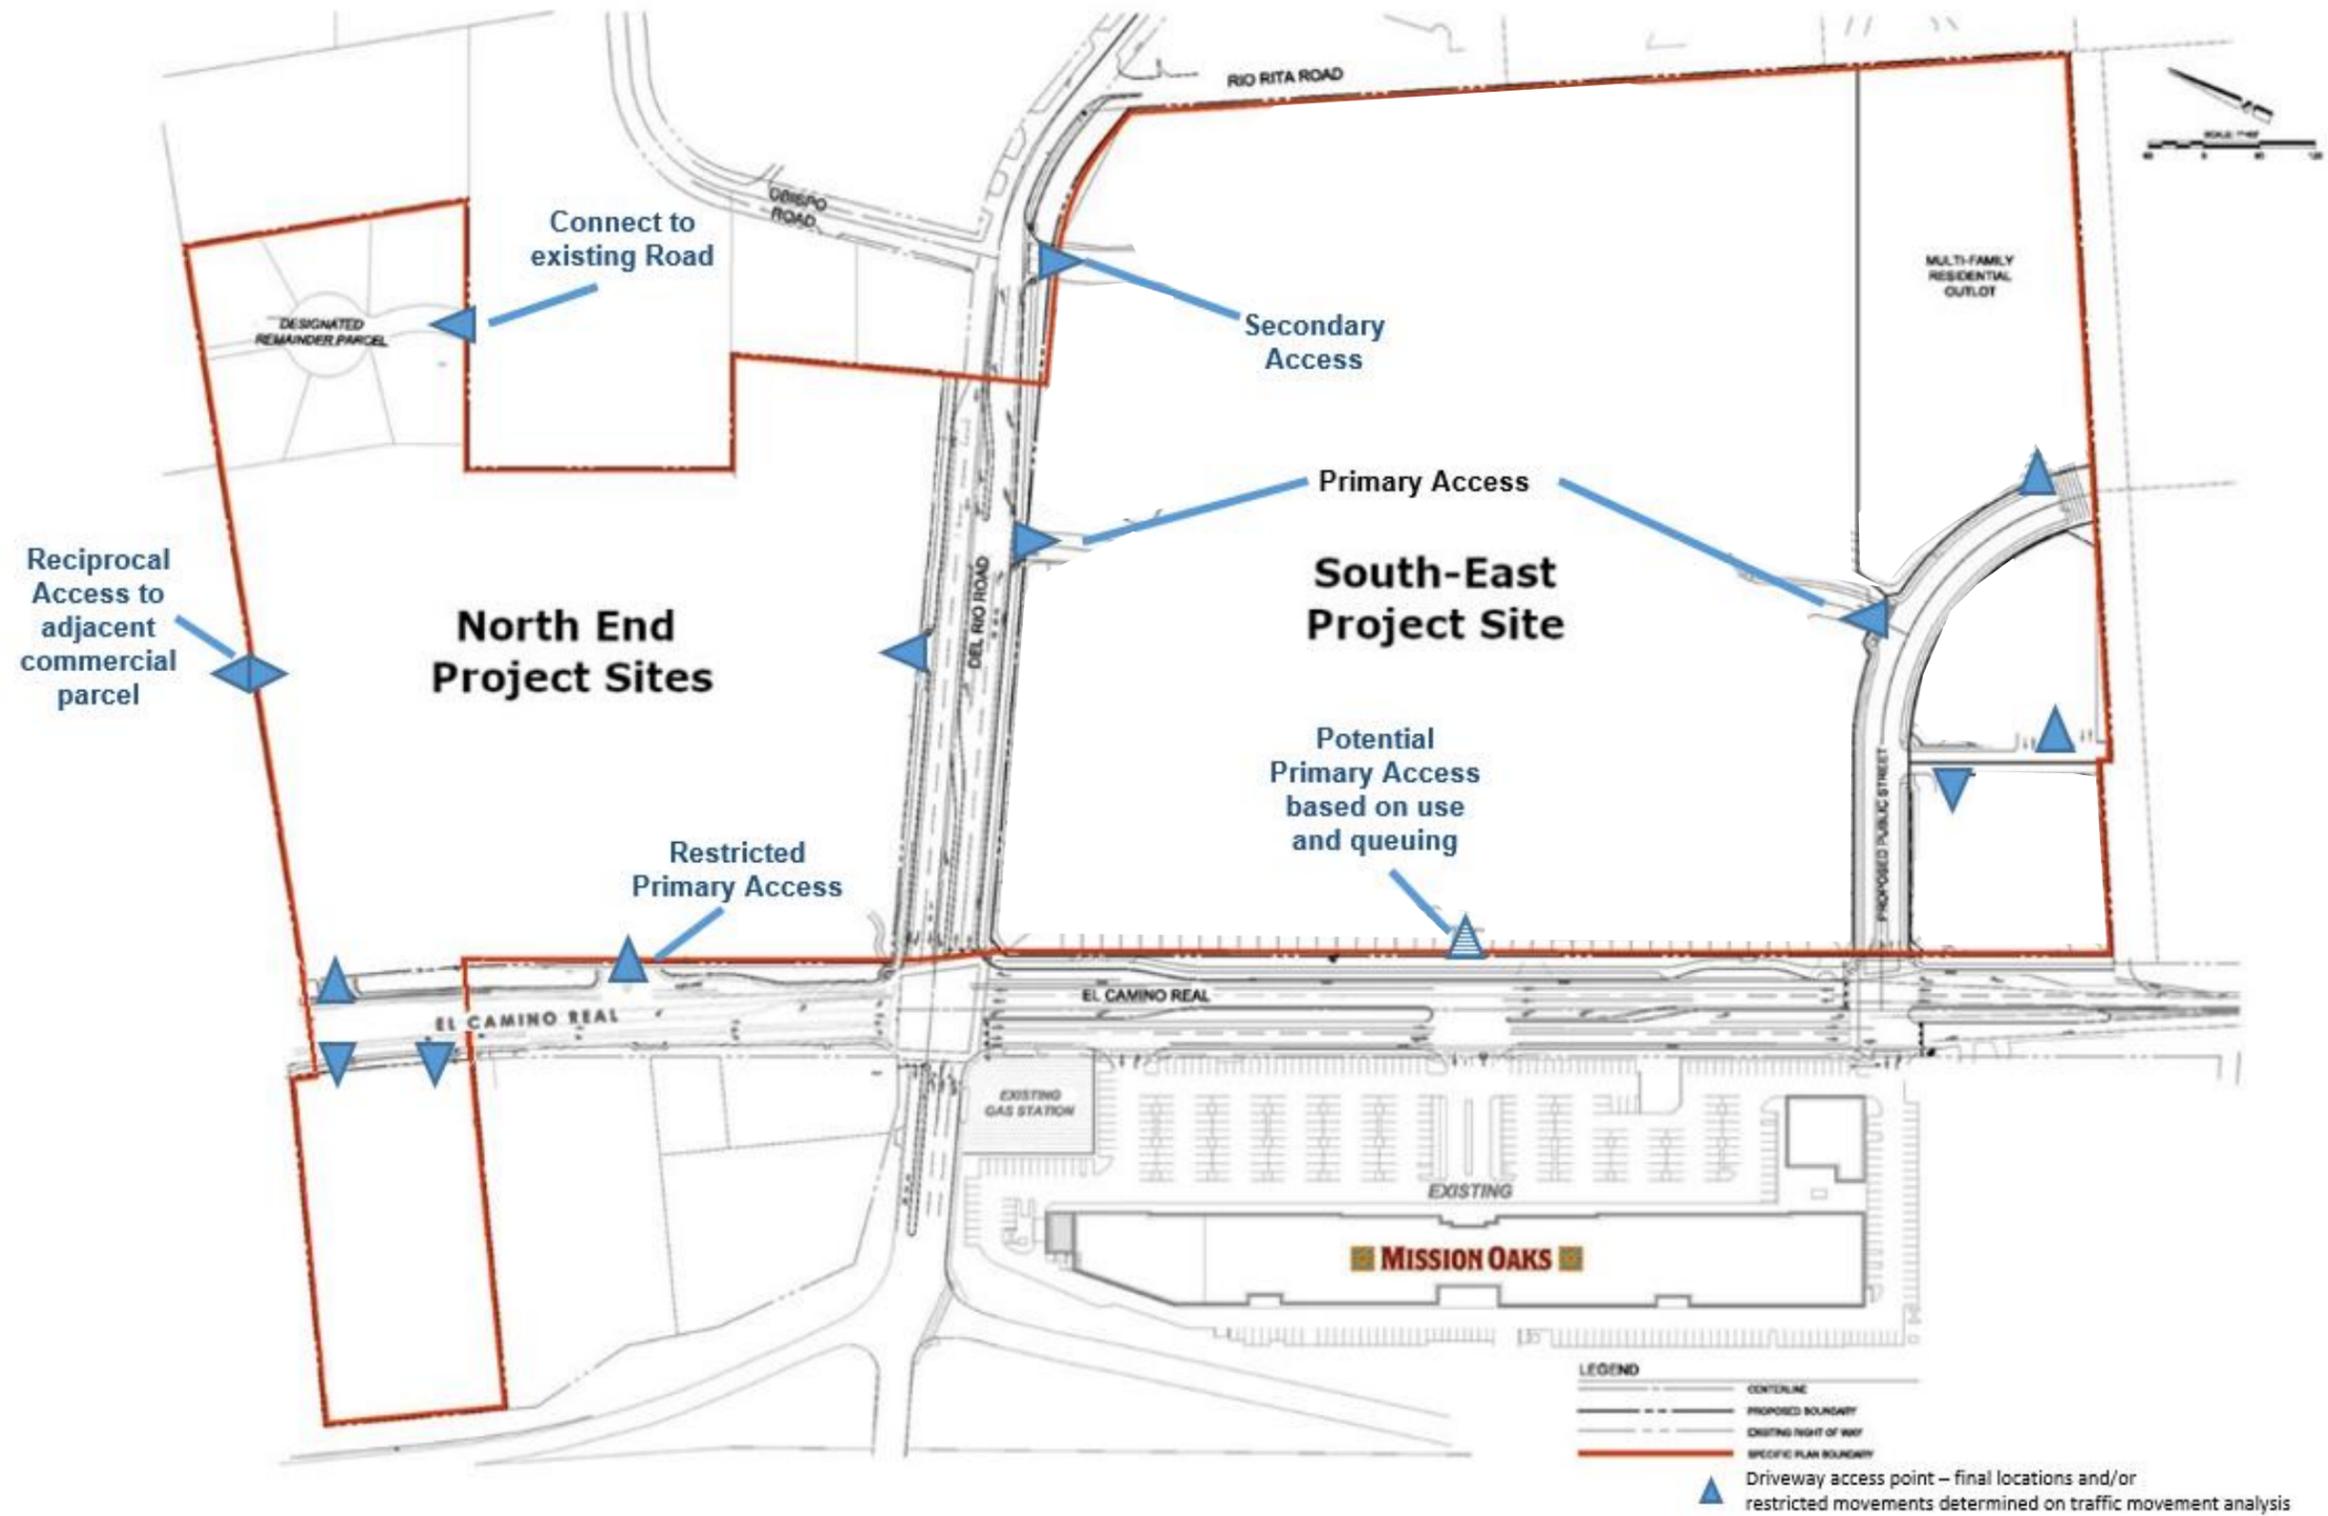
Del Rio Road Commercial Area Specific Plan Conceptual Circulation Plan
